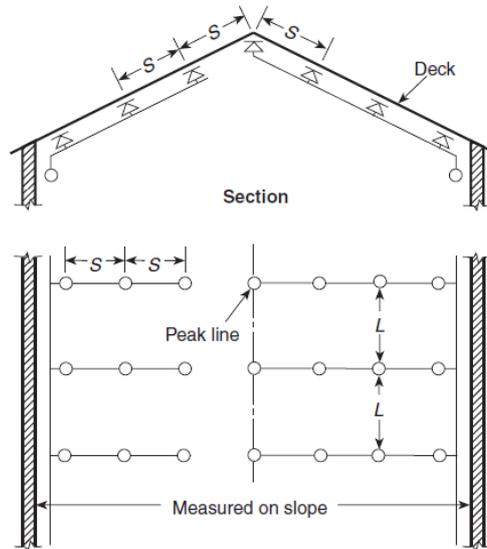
(a) Maximum Distance Between Sprinklers with Sloped Ceilings — Arrangement A.
